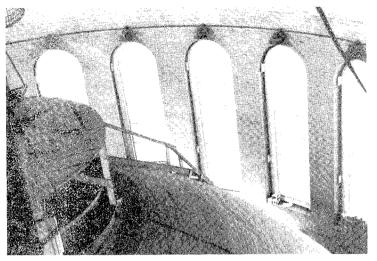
EXISTING TRUSSES AT UPPER DOME
